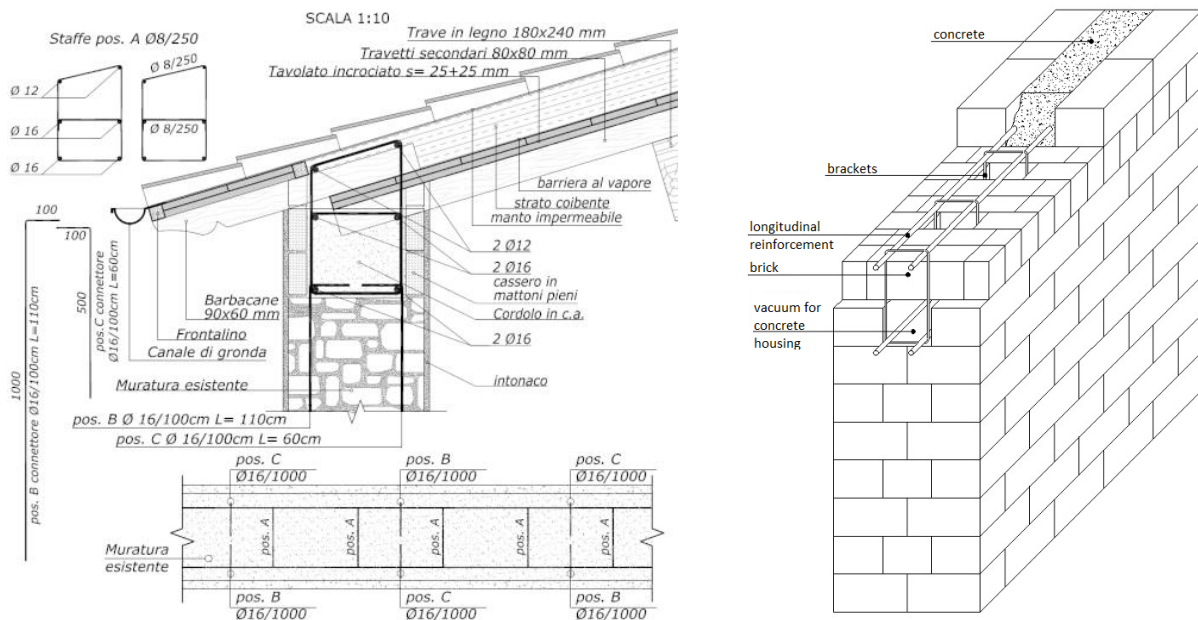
typical RC ring beam; typical reinforced masonry ring beam.
